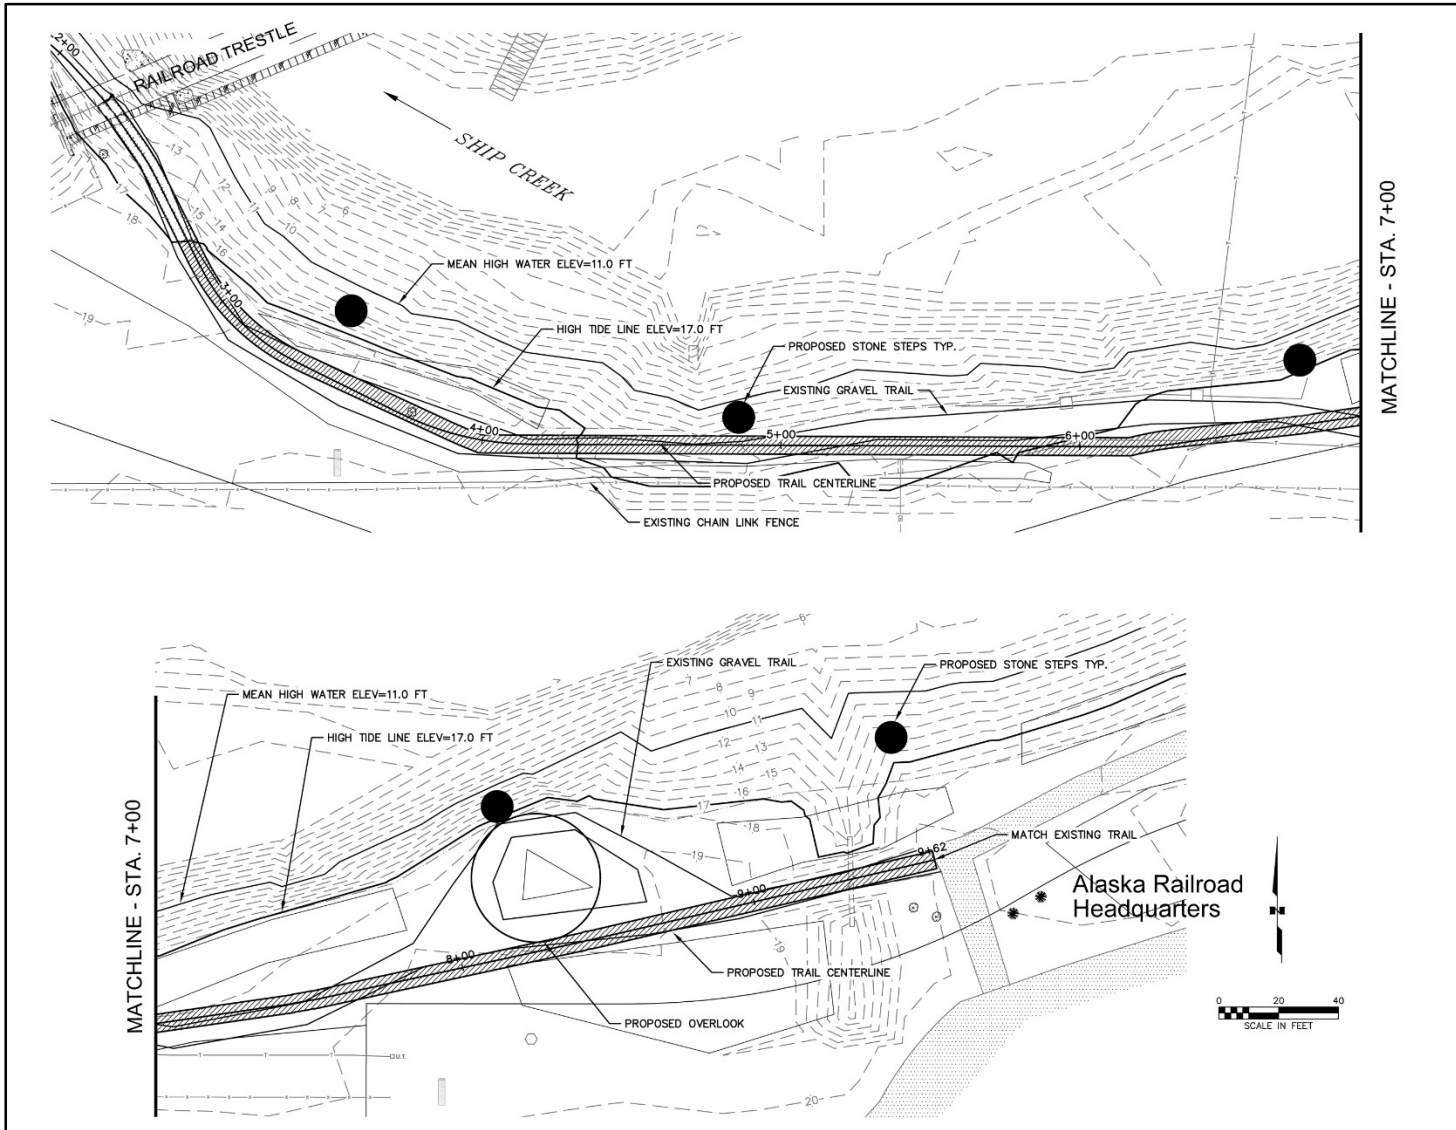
Plan view of South Bank Trail improvements, with locations of stone steps.
